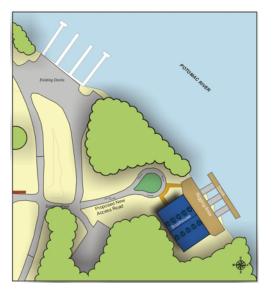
Conceptual Site Plan – Maximum Program, Daingerfield Island Site
